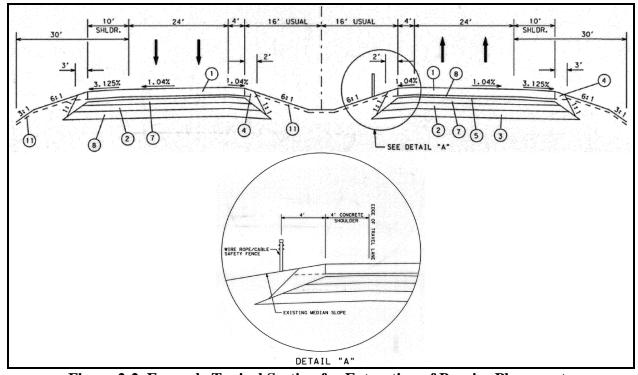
Example Typical Section for Extraction of Barrier Placement.
